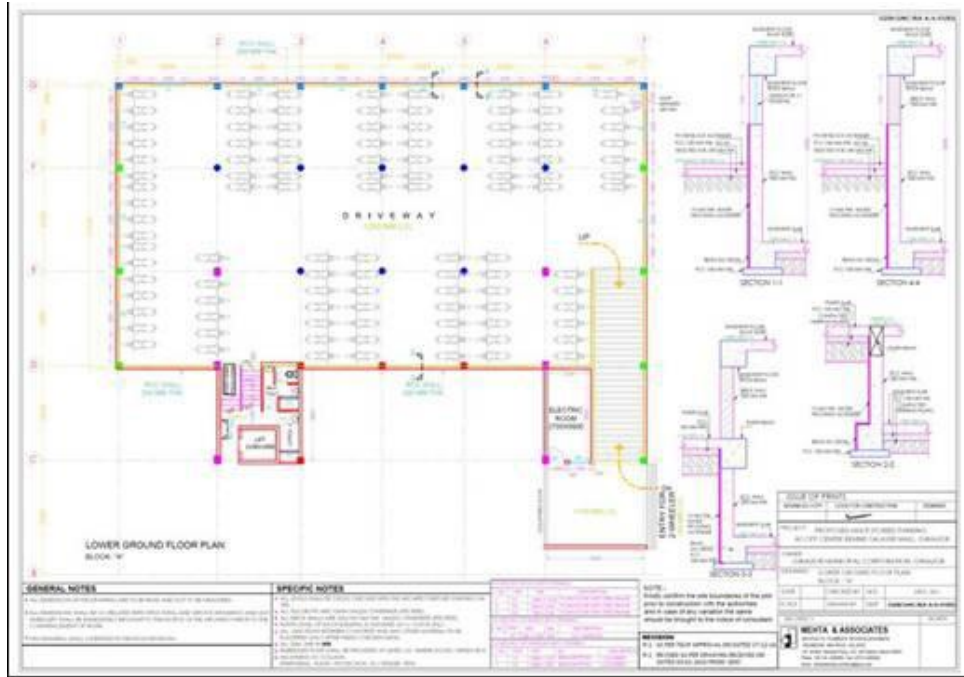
Parking Location: Salasar Multi Level Parking (Basement-Block A)
